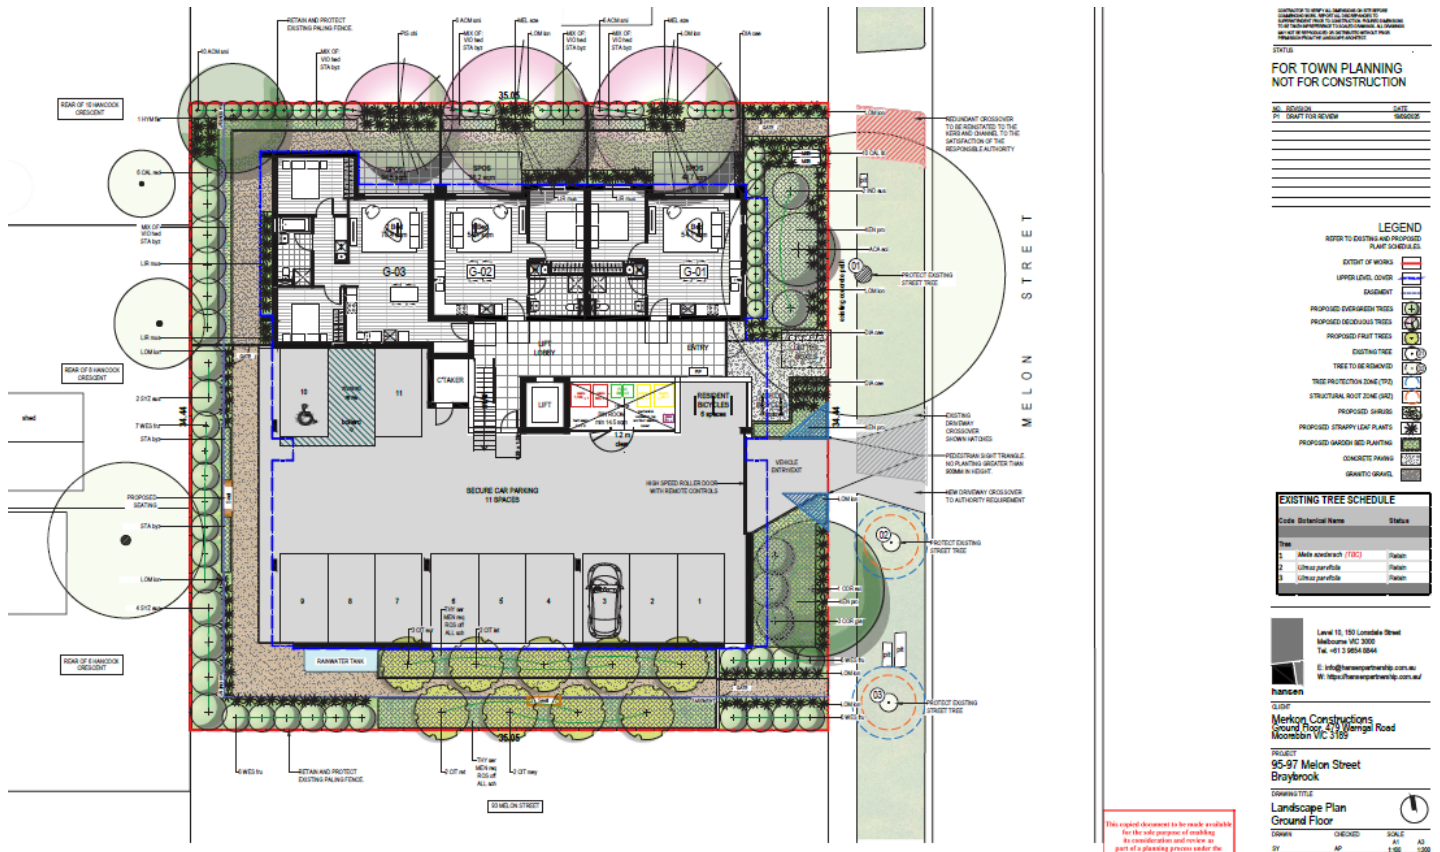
Extract from the landscape concept plan showing the proposed landscape features
